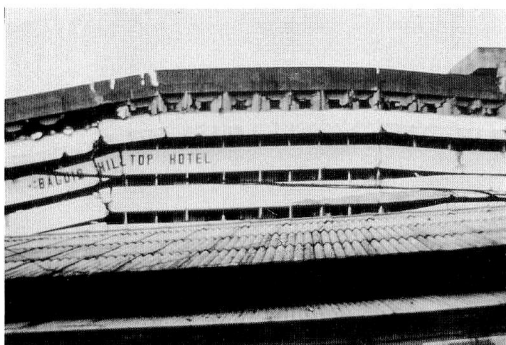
(a) BAGUIO HILLTOP HOTEL (south
